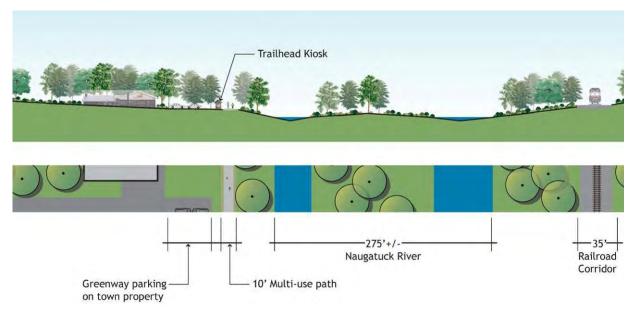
Site cross-section showing the recommended greenway alignment adjacent to the commercial properties between the river and South Main Street.
